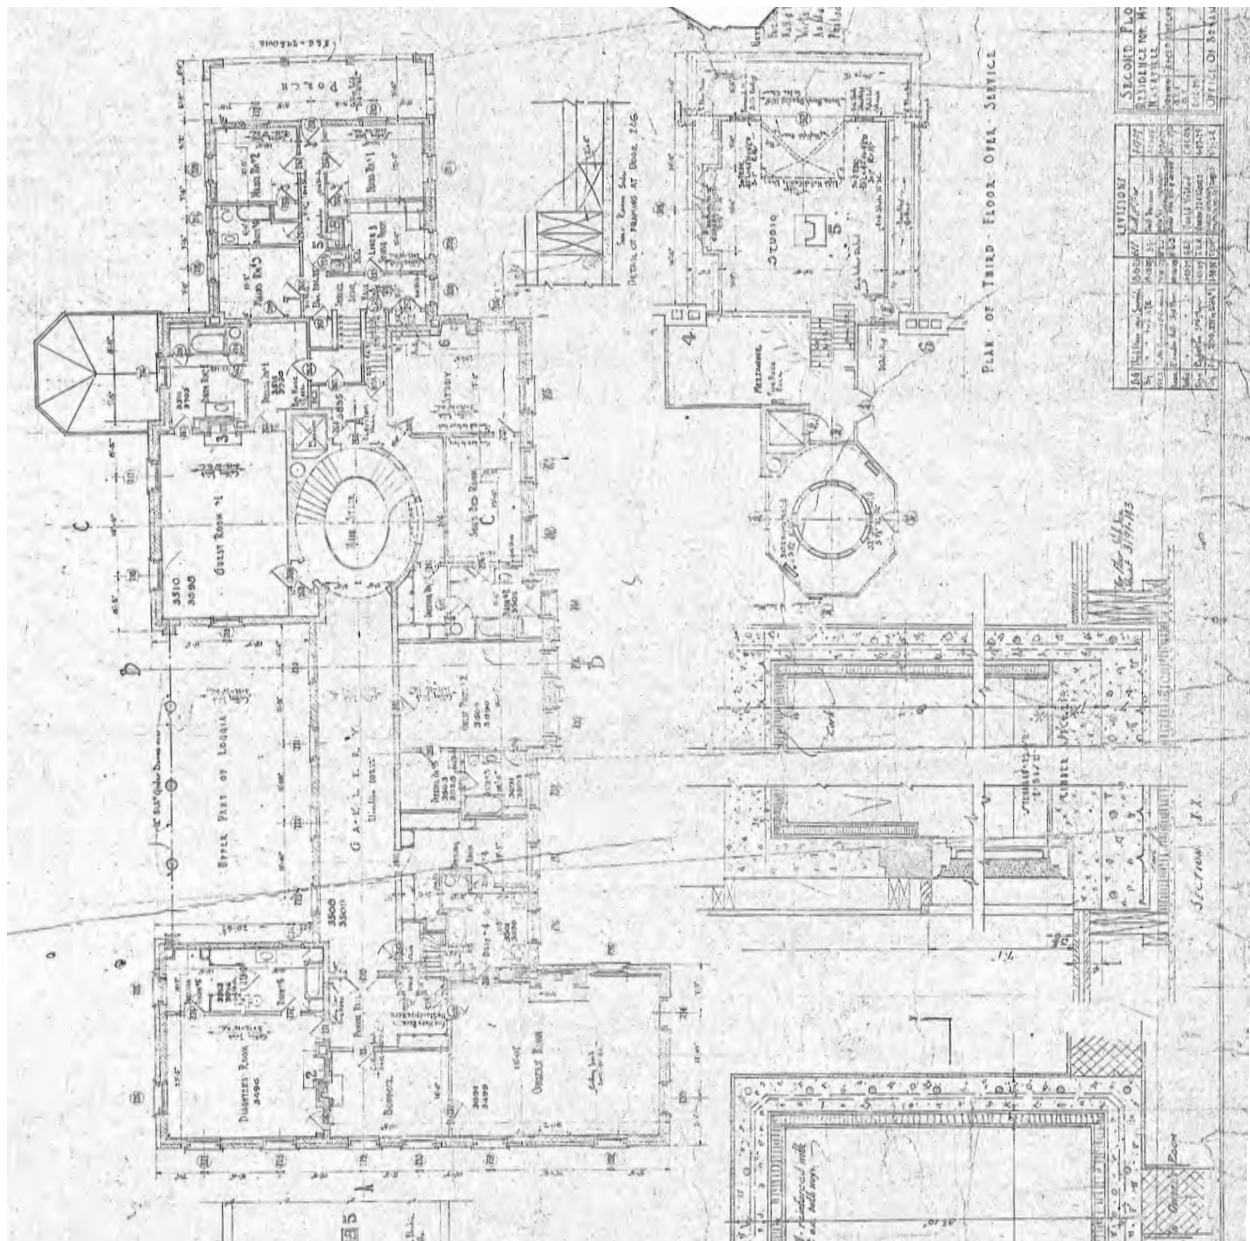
Second Floor and Attic Layout from Original Blueprints
